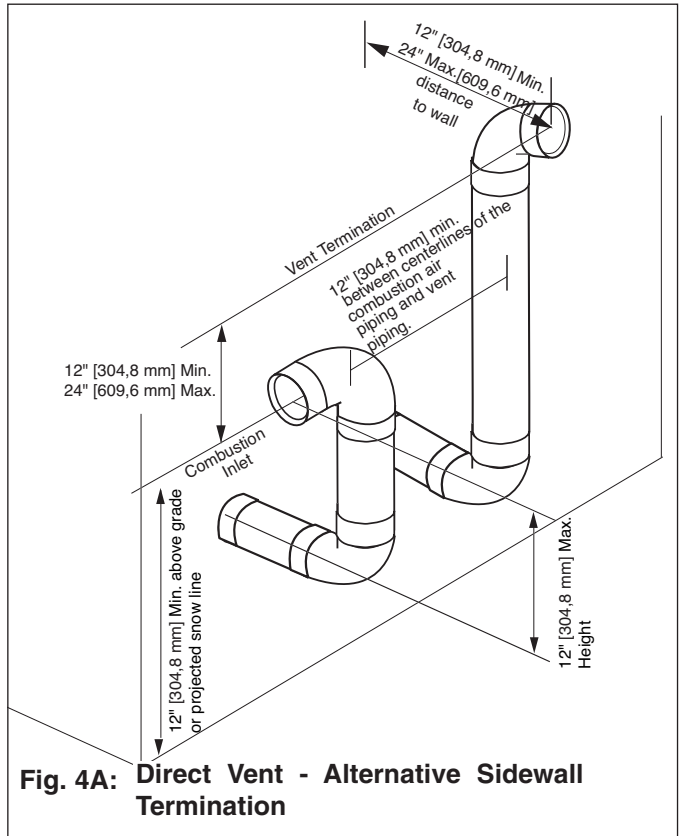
A: Direct Vent - Alternative Sidewall Termination
